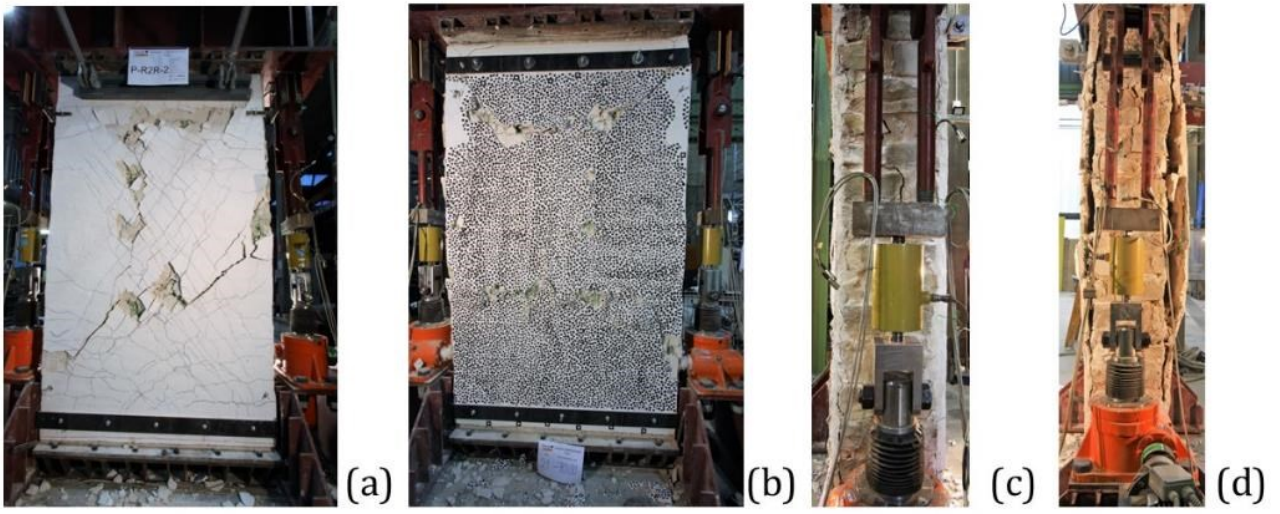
(P-R2R-2) view of the wall at collapse (a and b), vertical cracks between the leaves of the wall (c), detachment of the coating at collapse (d)
